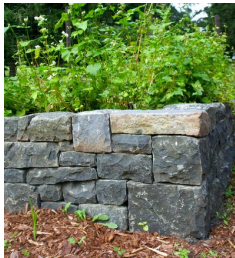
Aa. A retaining wall constructed from blocks of granite.
